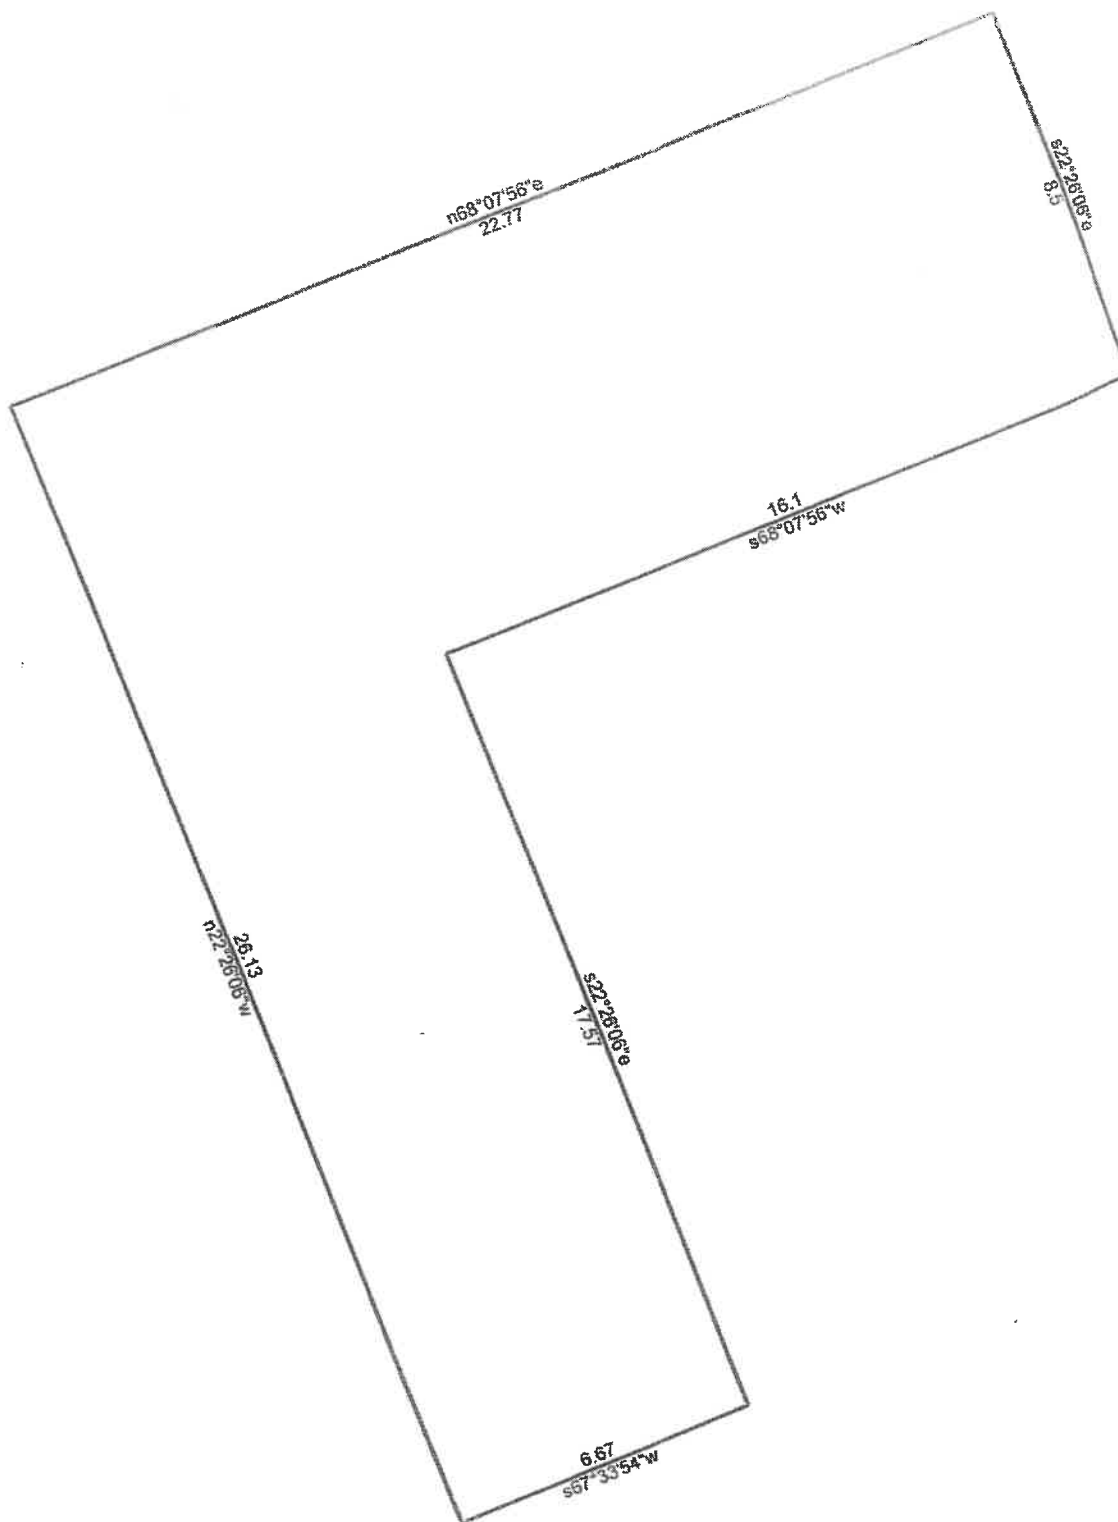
Exhibit B - City of Meridian Water Easement Linder Village West Subdivision
